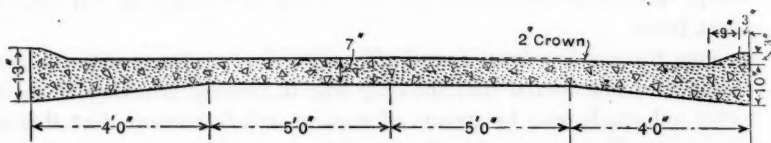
PAVEMENT SECTION USED BY IOWA HIGHWAY COMMISSION ON HILLS TO CARRY SURFACE WATER ON SLAB.
